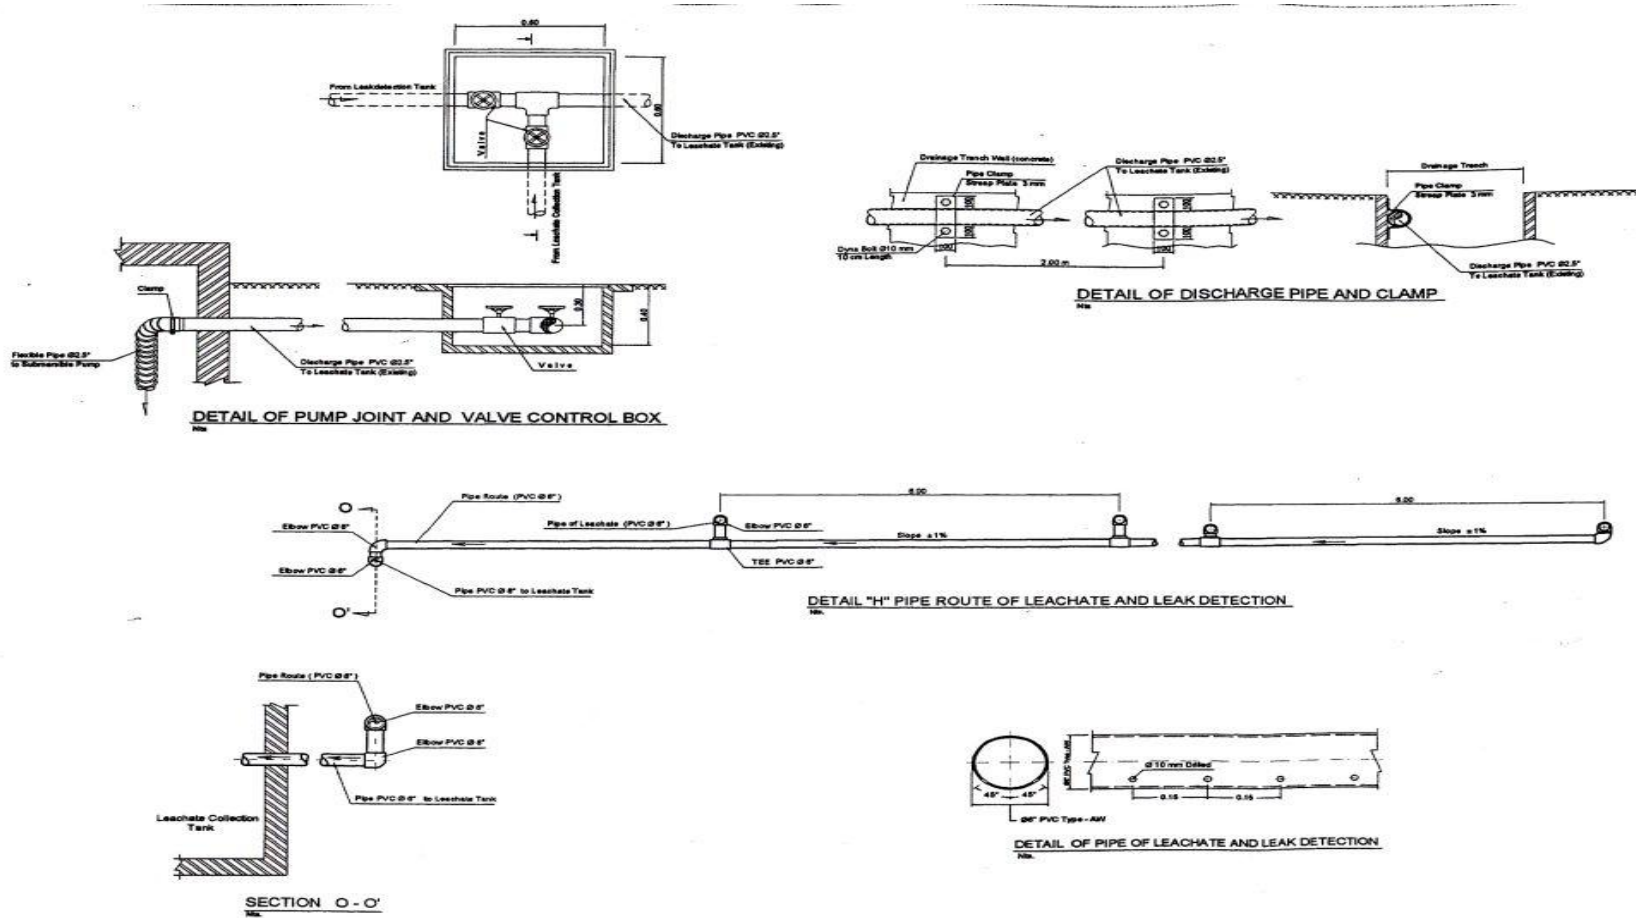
Discharge Pipe and Clamp Detail, Leachate Pipe and Valve Control Box For Pump Joint.
